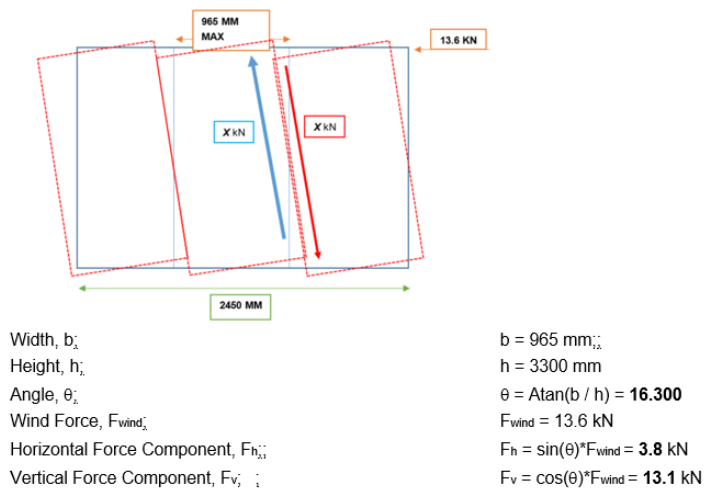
Connecting two GLT panels together for racking wall resistance
